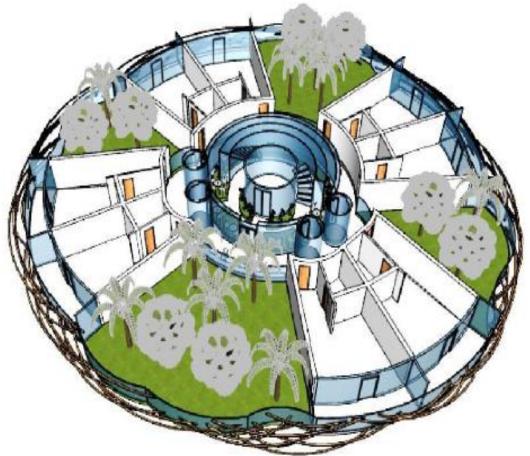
View of the floor with one central internal elevator and four high- speed external elevators.
